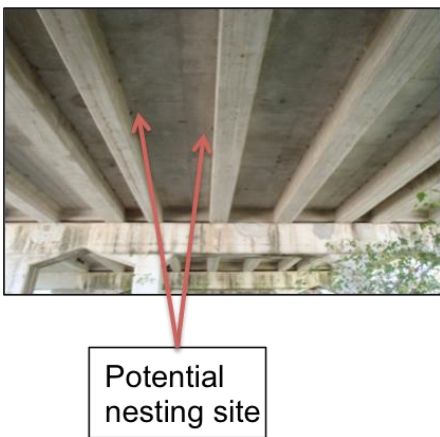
Illustration of a girder T-beam bridge design type with potential nesting sites
